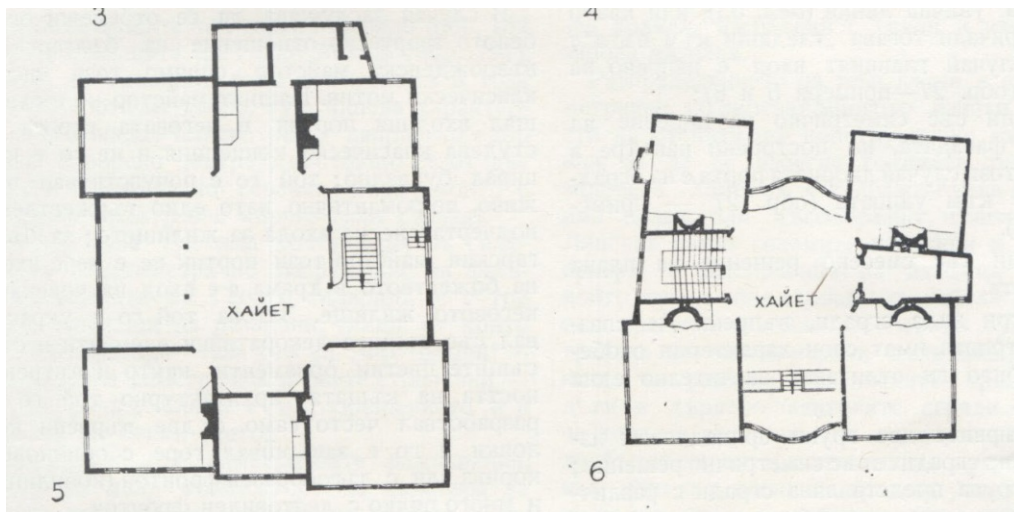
Symmetrical houses built on the street border (Peev, 1960)
